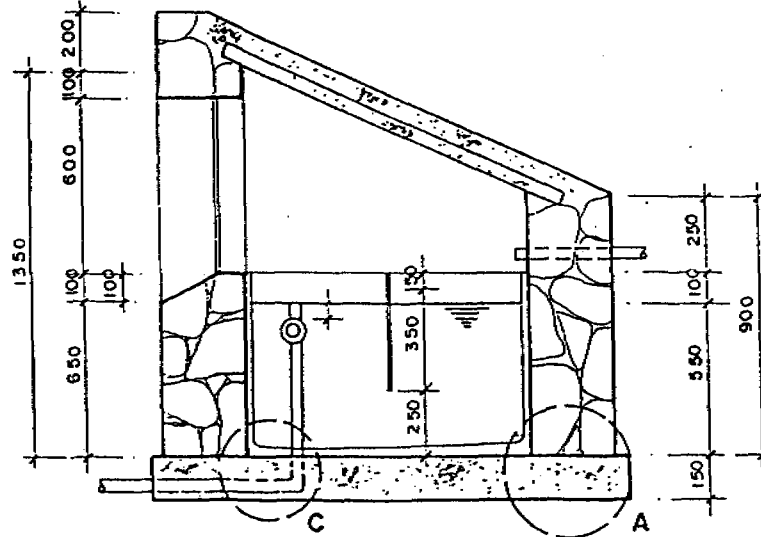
TYPICAL DETAILS OF MASONRY SEDIMENTATION TANK.
